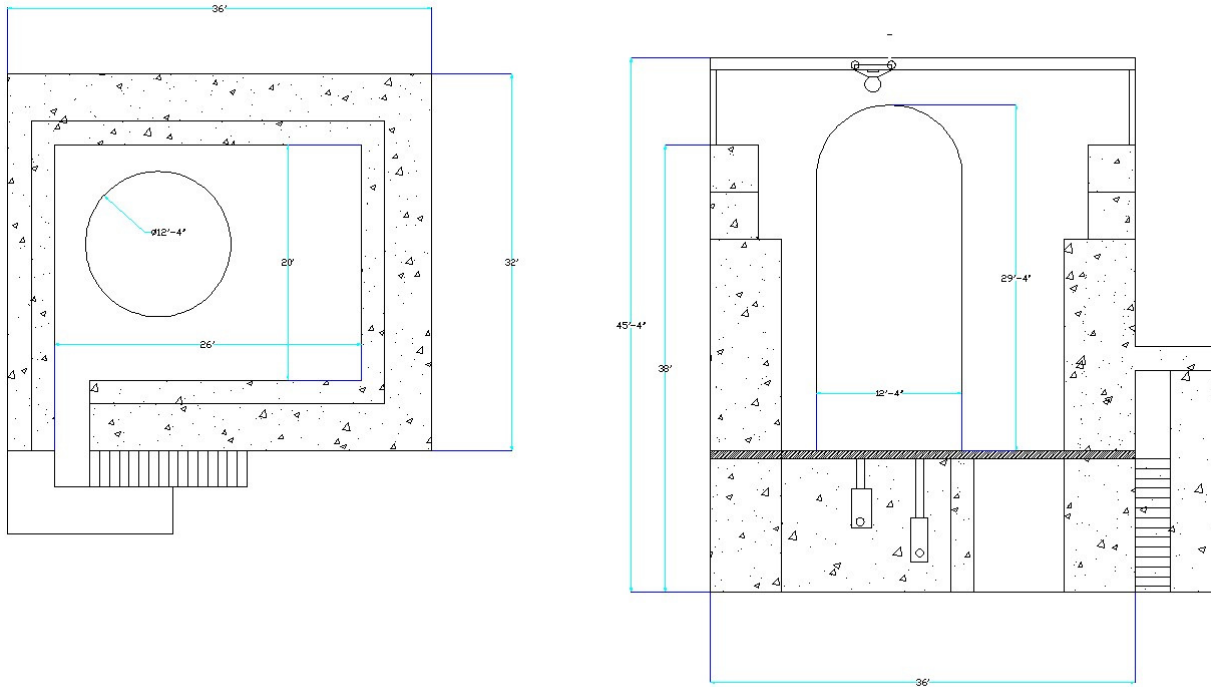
Schematic drawing of blockhouse which will host Pelletron.
